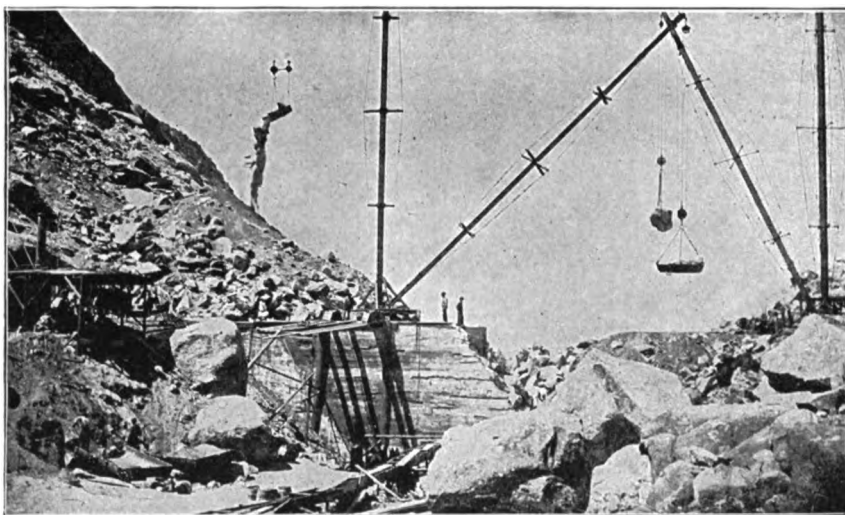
MORENA ROCK-FILL DAM, SHOWING A PORTION OF TOE-WALL UNDER CONSTRUCTION.
